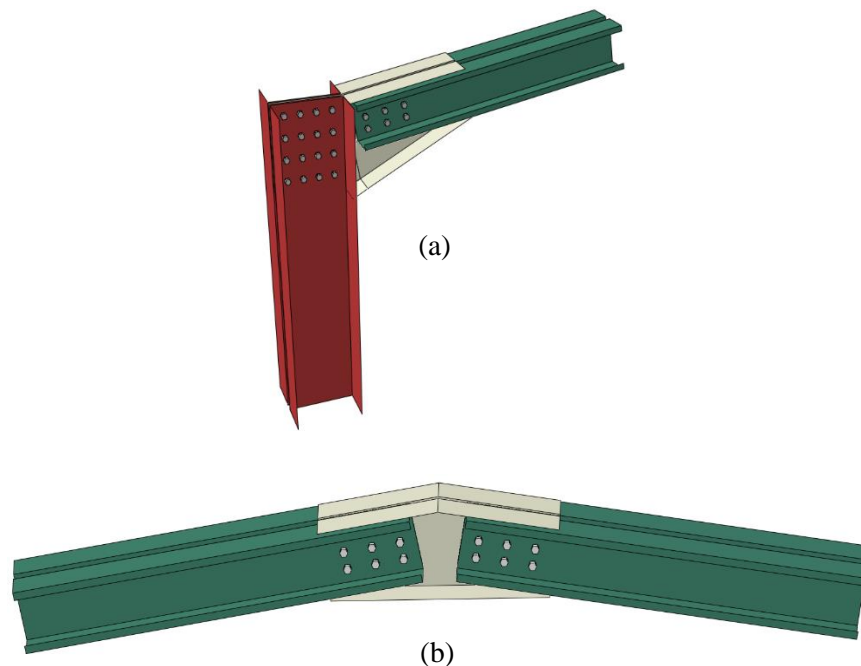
Typical CFS bolted moment connection: (a) eaves connection, and (b) apex connection
